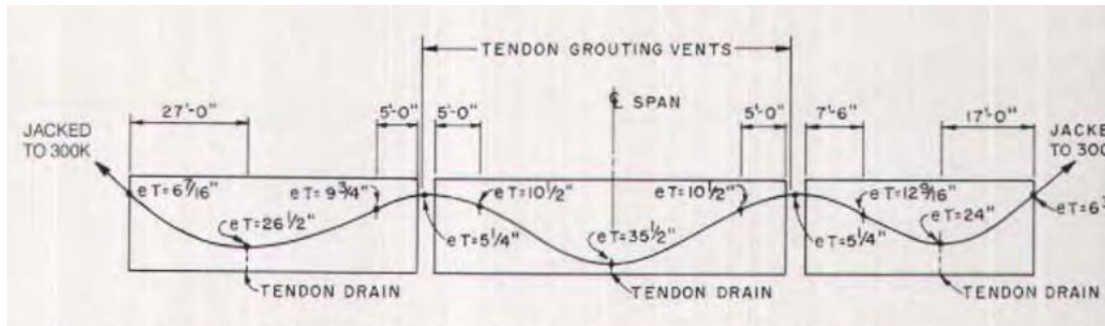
Layout of posttensioning strands in the bridge deck (Owen 1987)
